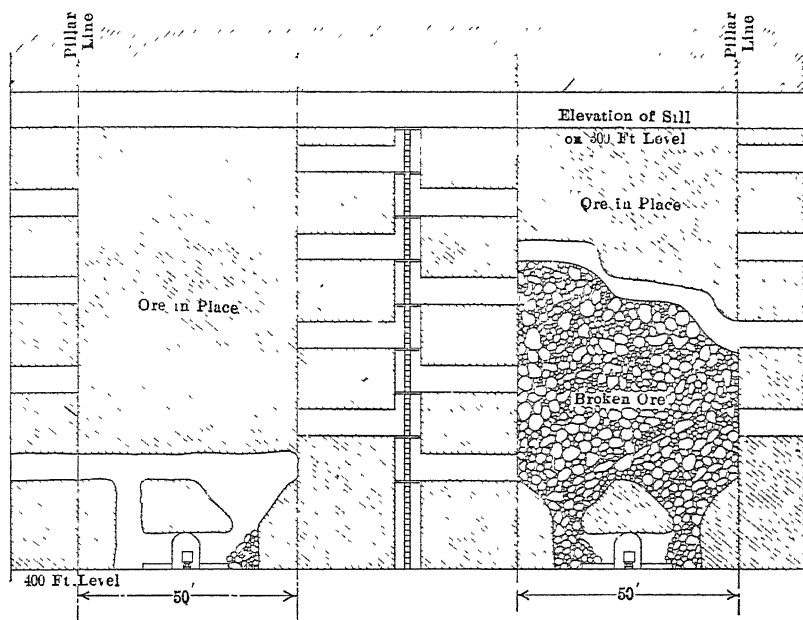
SECTION THROUGH SHRINKAGE STOPE.
